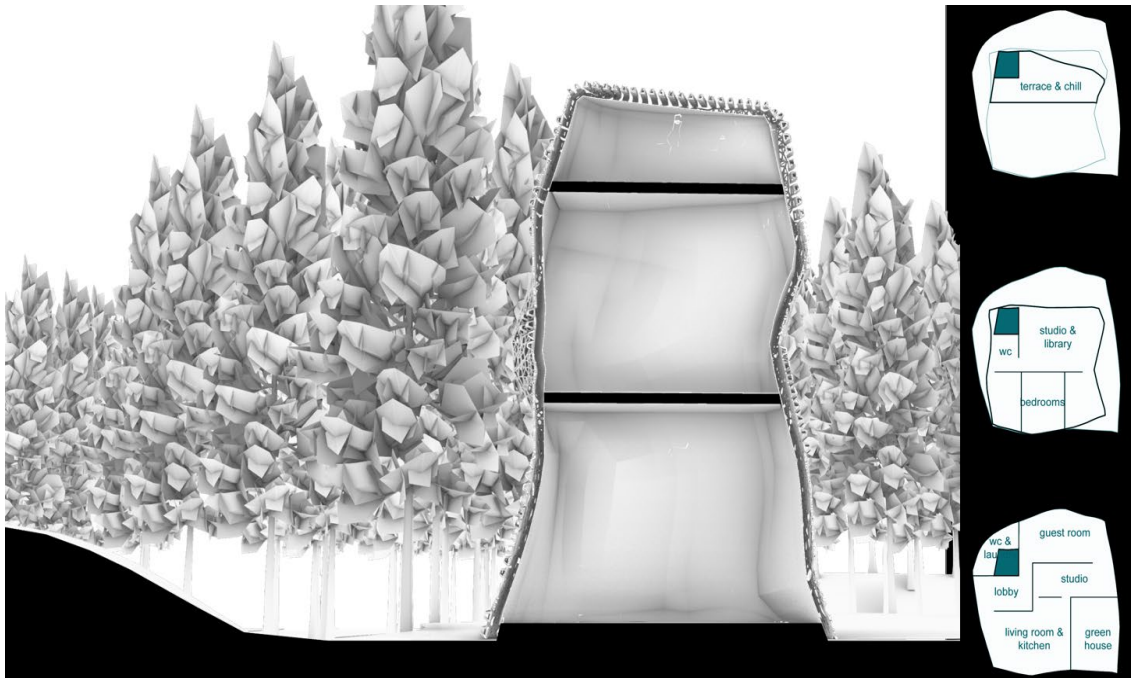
Section and possible plan layouts⁴⁶⁶
